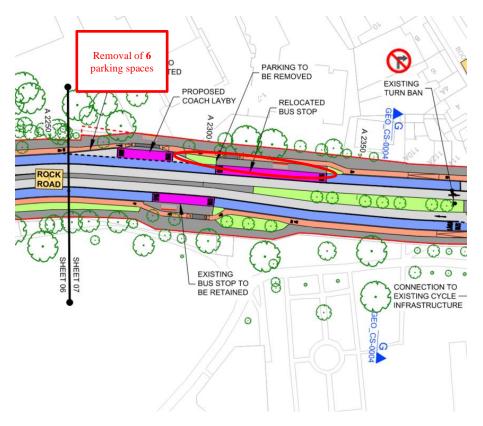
Proposed scheme design on Rock Road at Booterstown Avenue
